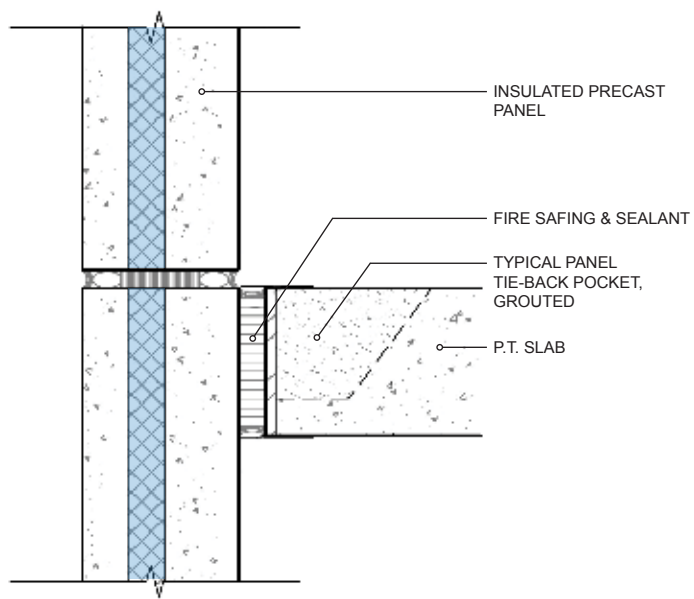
The exterior wall system at Opus Residence Hall at Catholic University of America consists of insulated precast concrete panels sandwiching a layer of polyisocyanurate insulation. Drawing: Little Diversified Architectural Consulting
